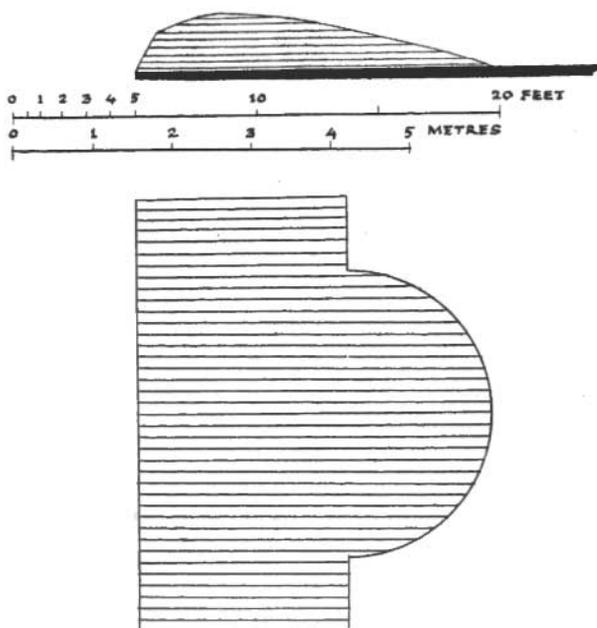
FIG. II. TYPICAL BALLISTARIUM IN B, SECTION AND PLAN
